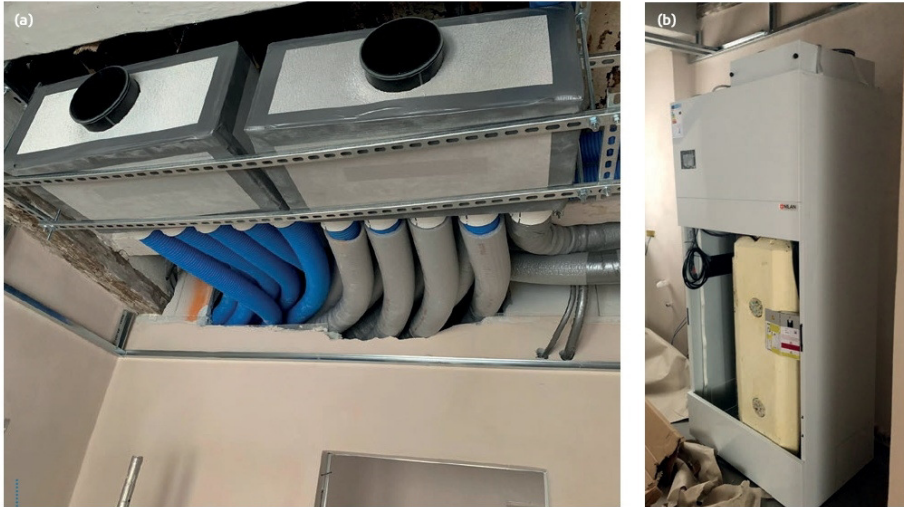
(a) Exhaust and inlet air plenum (b) VPM machine
